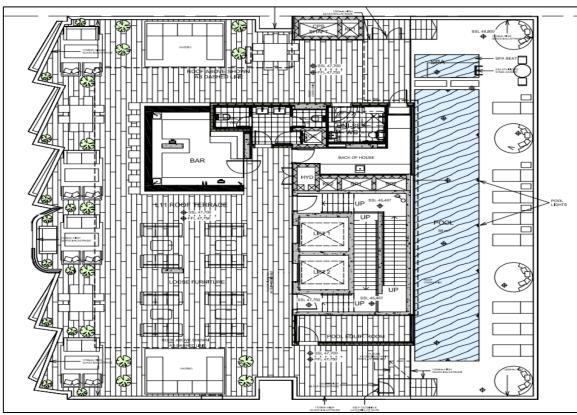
Extract of applicants existing rooftop plan as a licensed premises (known as Sky lounge), inclusive of bar facilities.
